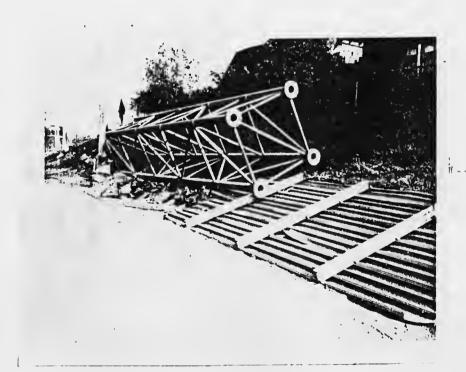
West end of truss (Section A, Exhibit 2) with damaged portion of sign.
